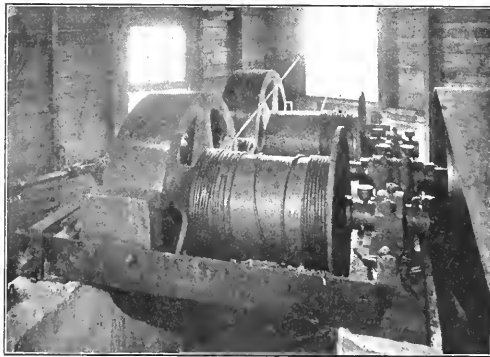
DRUMS, CABLES AND FRICTION DRIVE FOR SCRAPER
